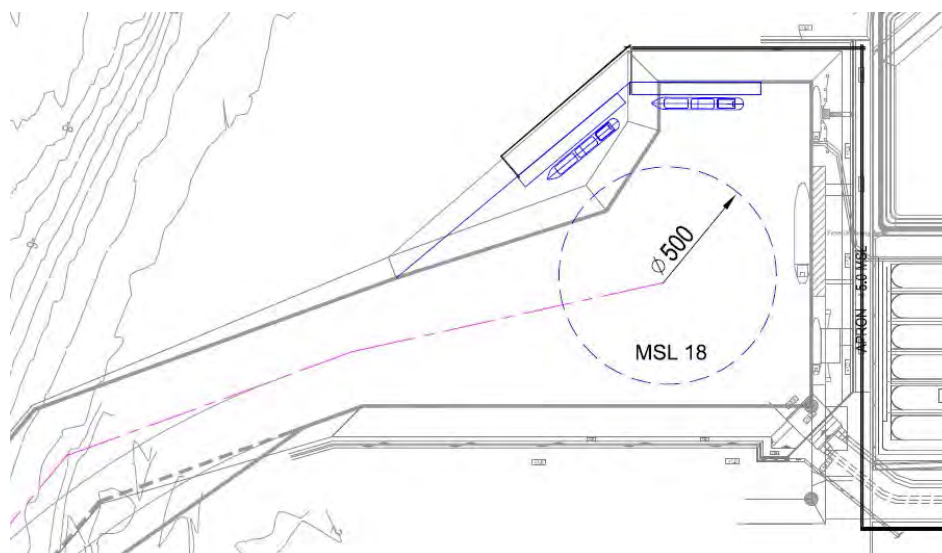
Layout Plan of Coal Unloading Berth in the 1st Phase
